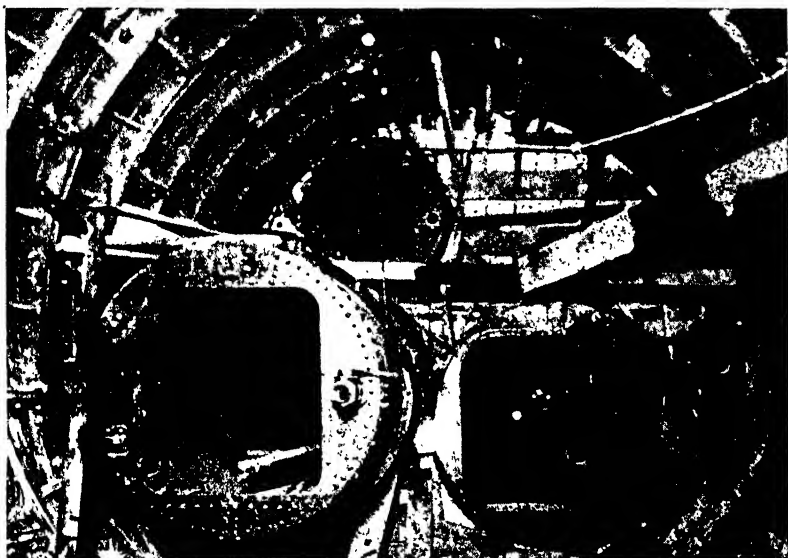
Concrete bulkhead being built in a cast-iron lined tunnel. The locks are set in place, and the bulkhead, usually 10 ft. thick, is built around them. The contact between concrete and iron lining is later grouted for airtightness.
